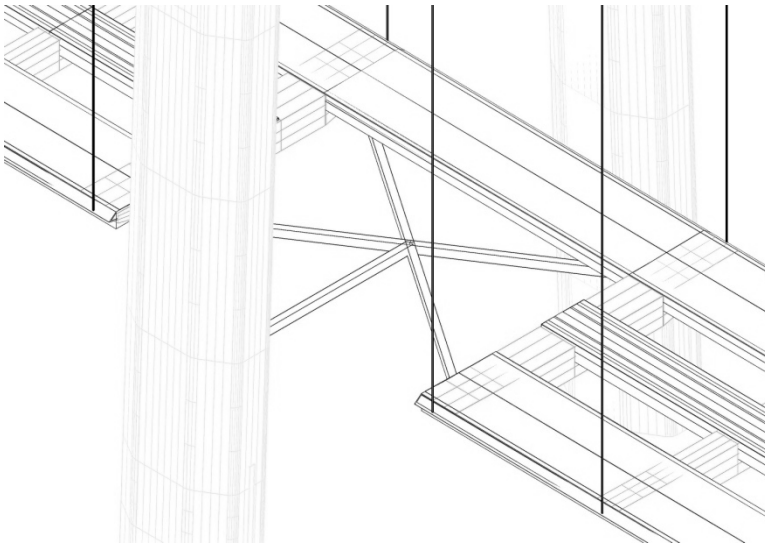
Messina Strait Bridge, geometry model of the transverse connection between the suspended deck and the towers (X-stiffener). For better view, the railway girder and one of the road girders are not shown in the region above the connection.
